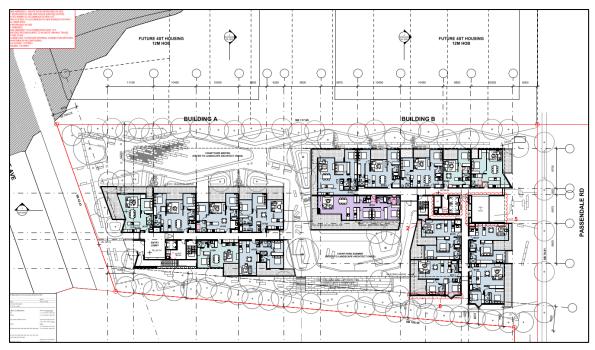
Proposed Ground Floor Plan (Building A & B) (Source: Stanisic Architects)
